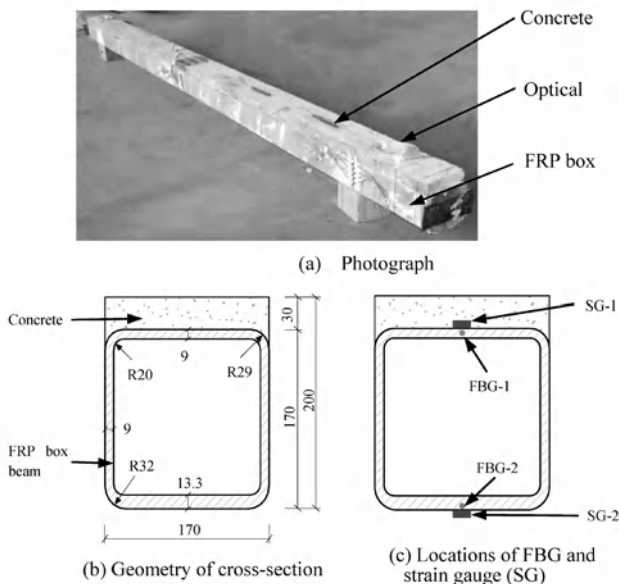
Smart FRP-concrete composite beam (Units in mm)
